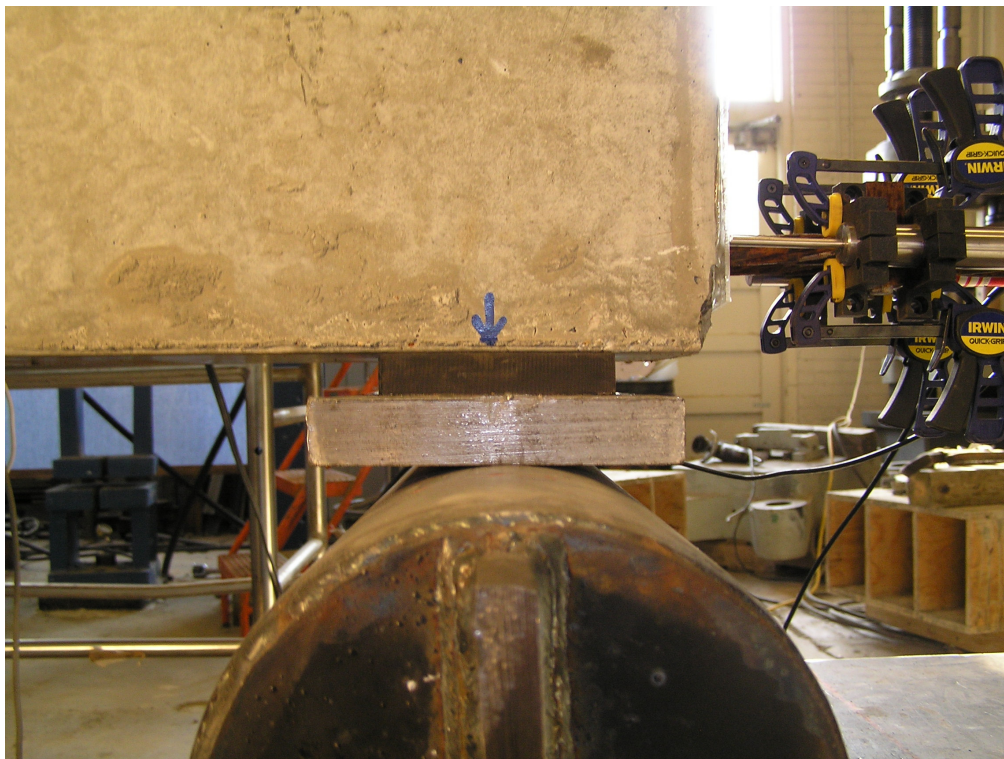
Photo showing a typical support (in this case – rectangular beam)
